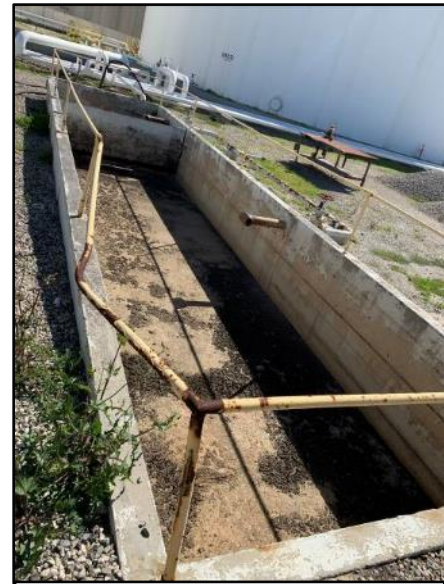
Concrete Oil/Water Separator Sump (to be demolished)
